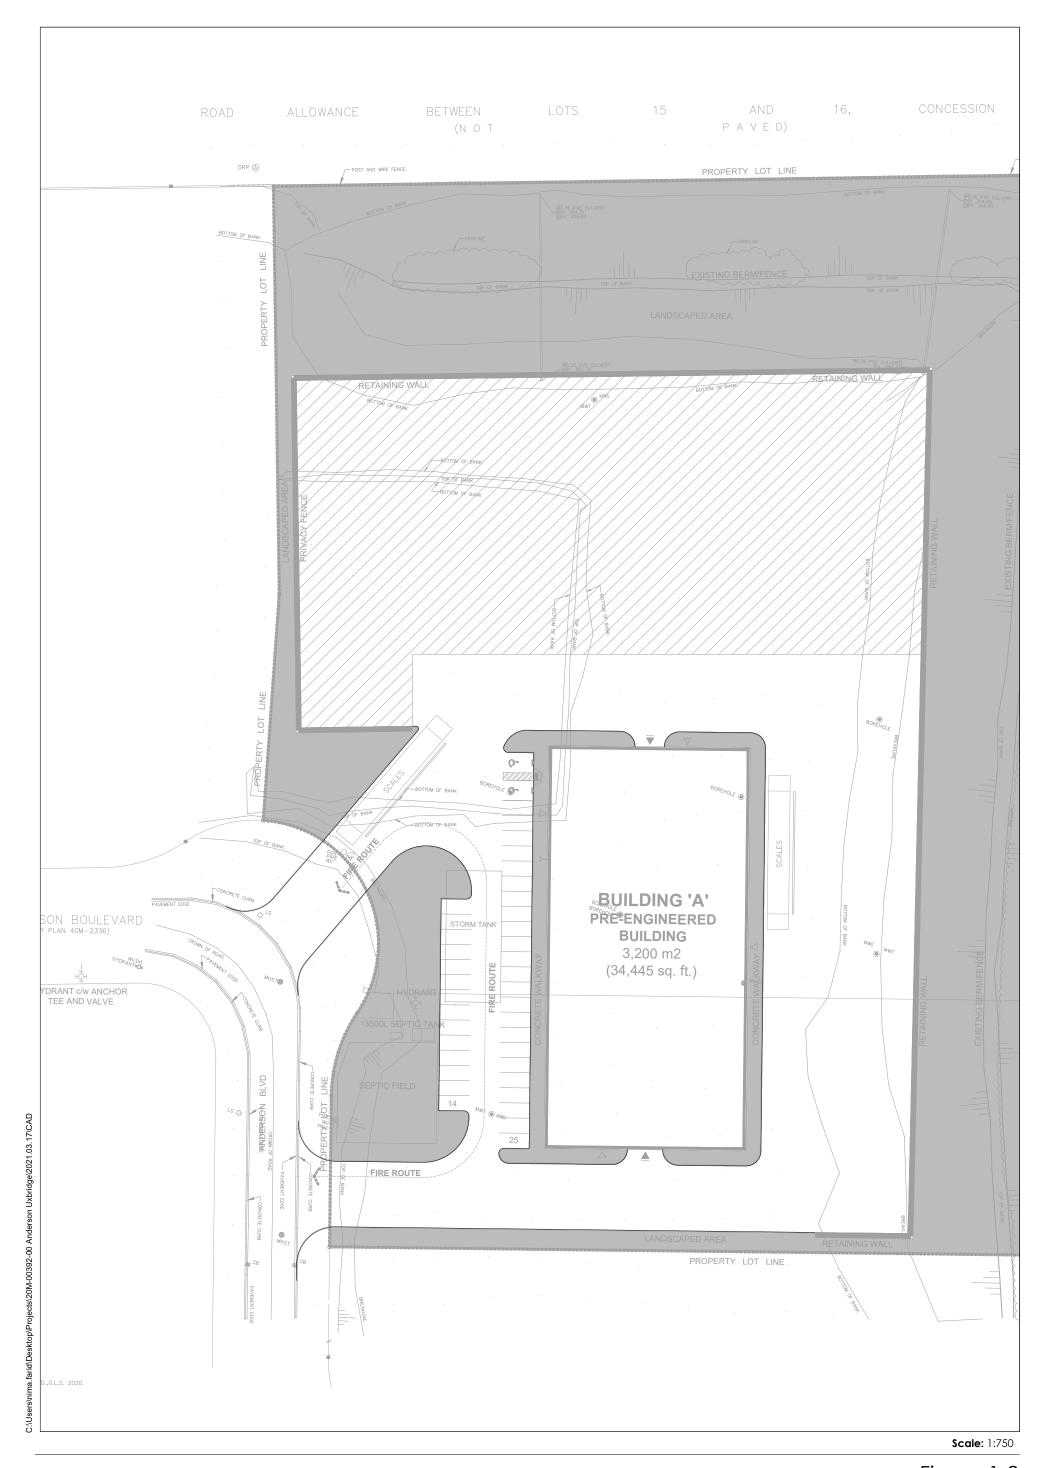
Site Plan Review 45-47 Anderson Boulevard Development TIS - Uxbridge
